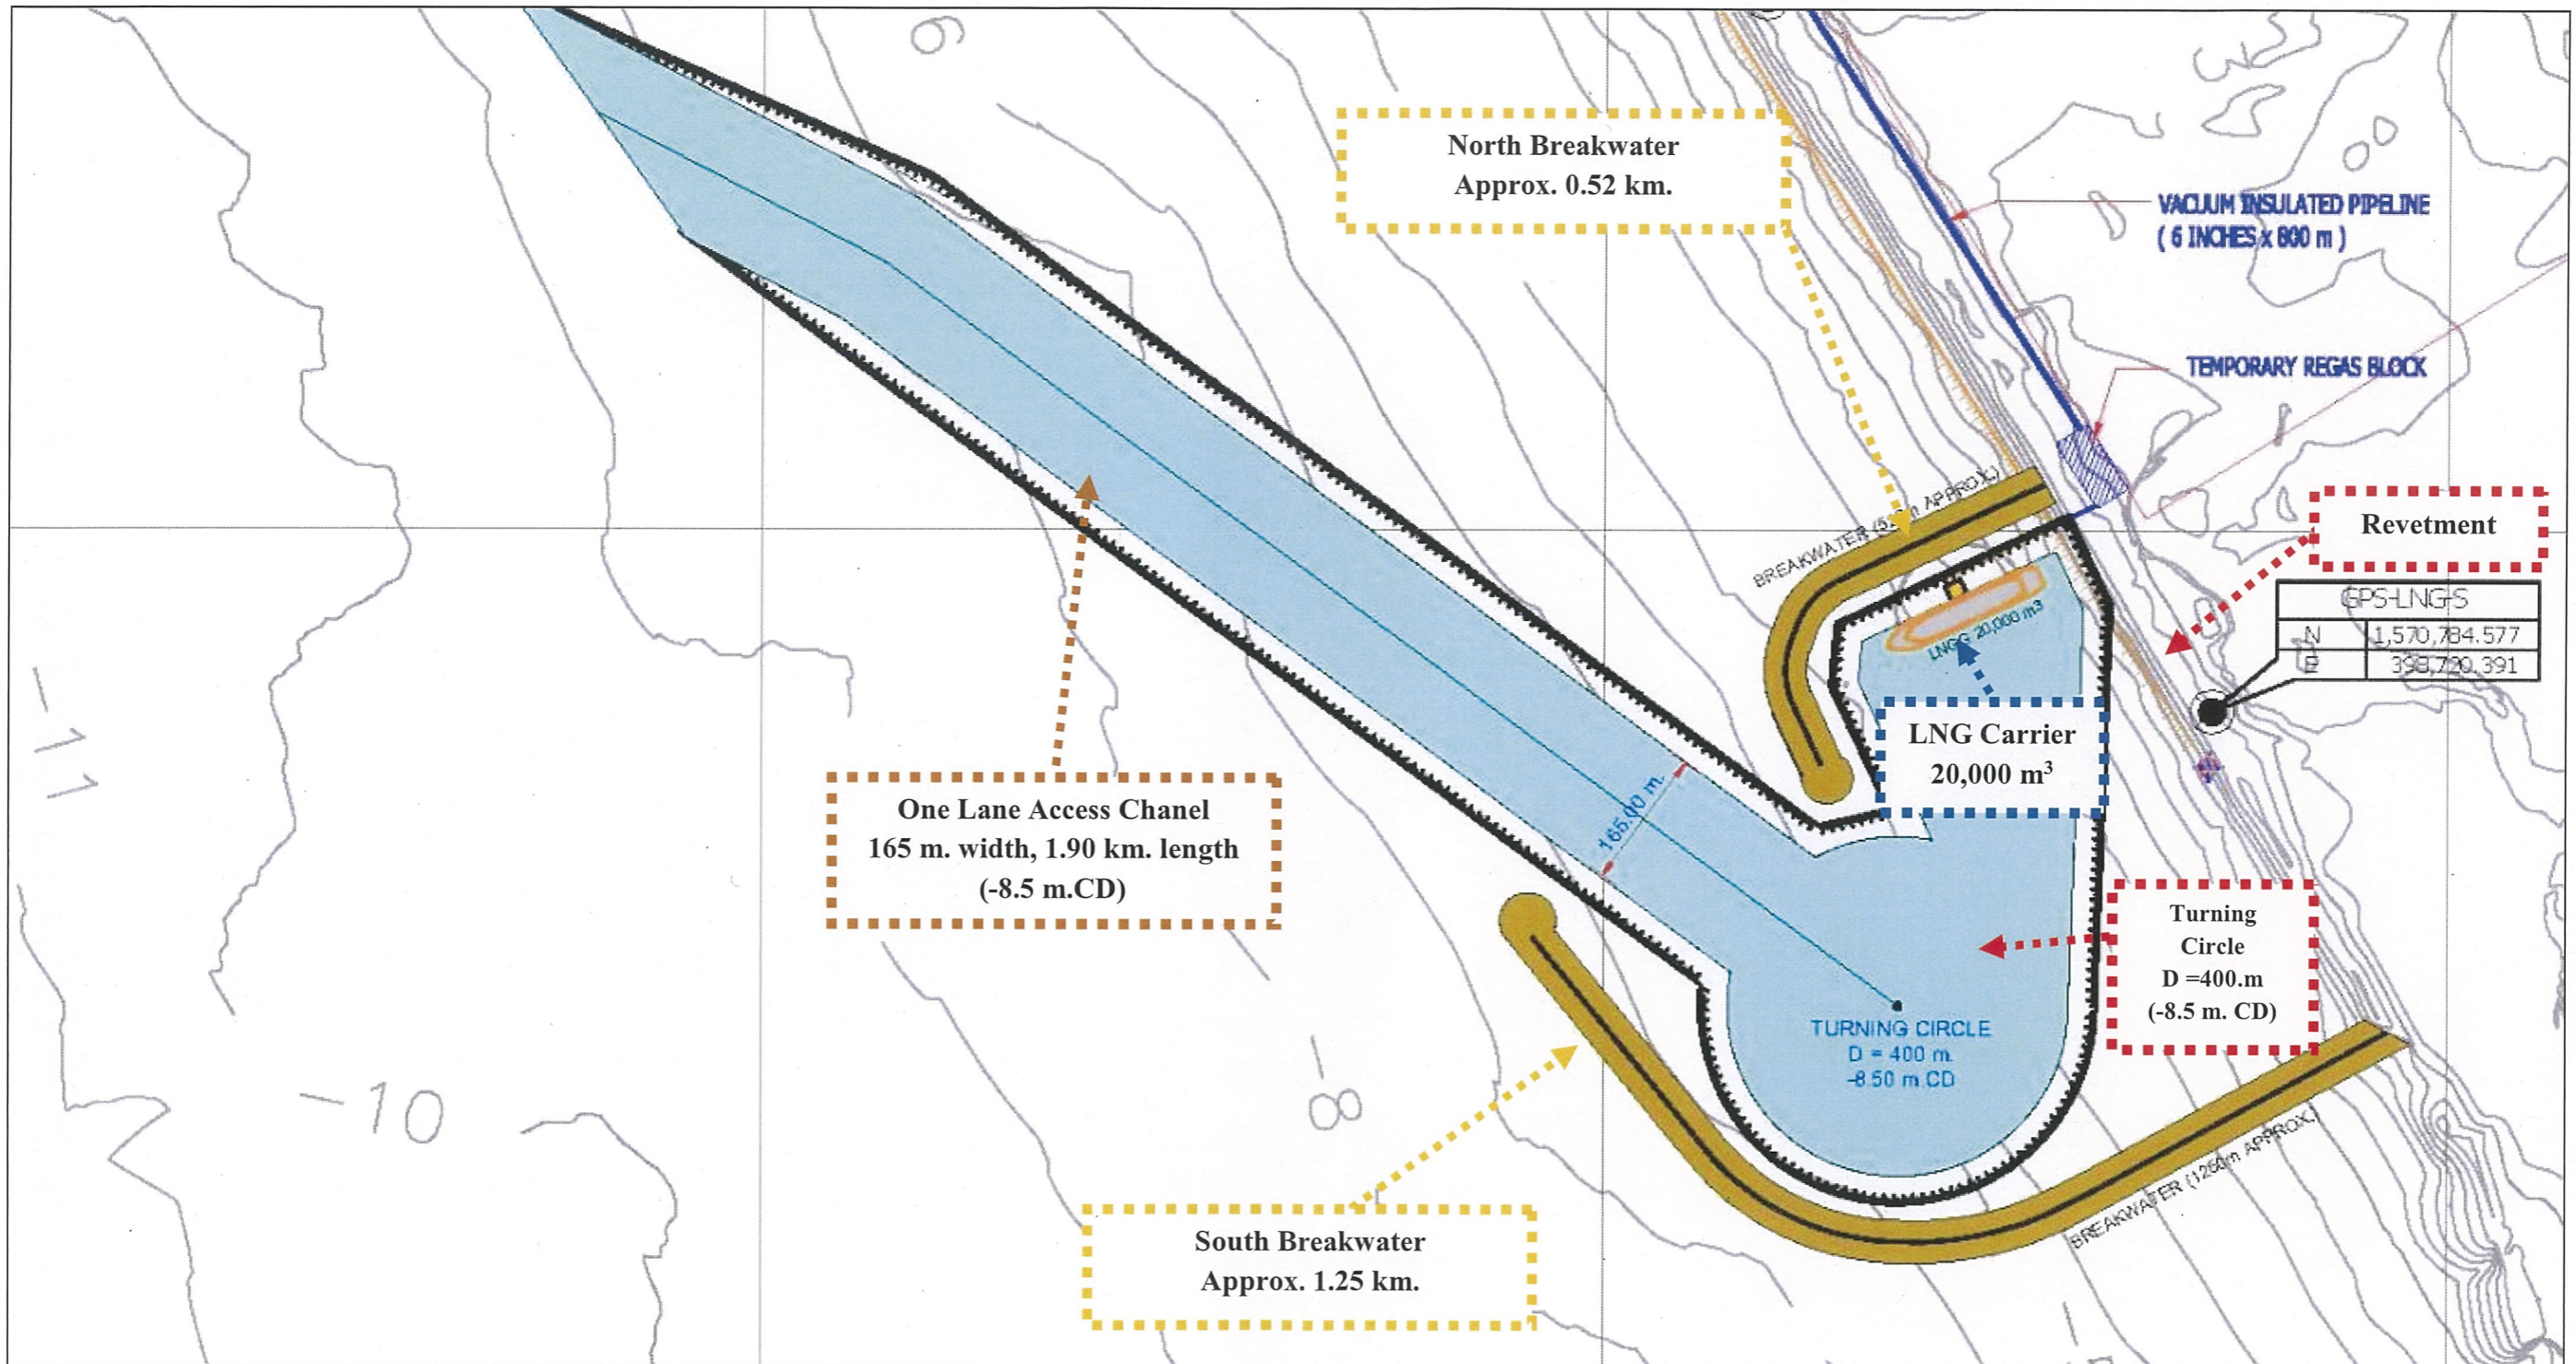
LAYOUT OF OFFSHORE FACILITIES
